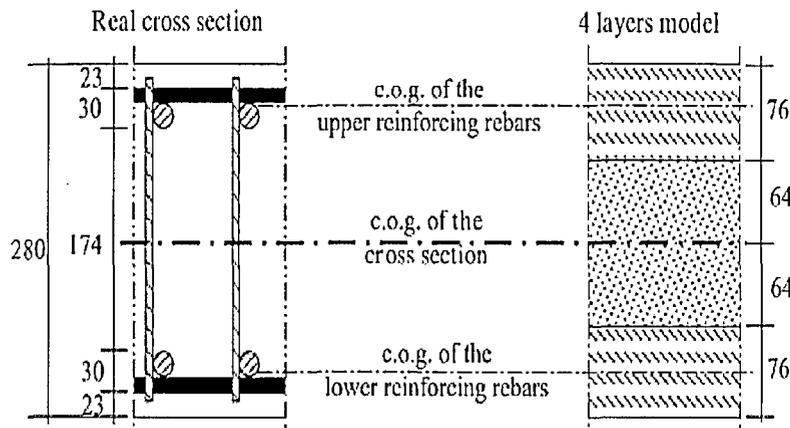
Cross section of the reinforced concrete structure with layers of the concrete.
